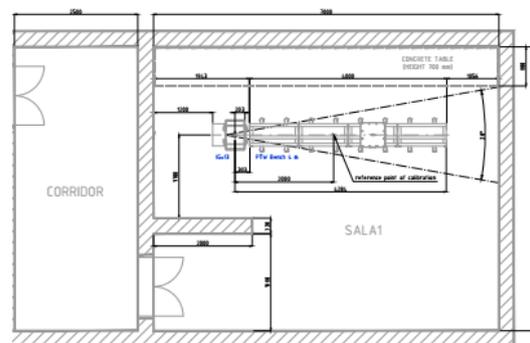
View from above of the ground floor of the selected building site for LABCAL assembly (source: authors)
